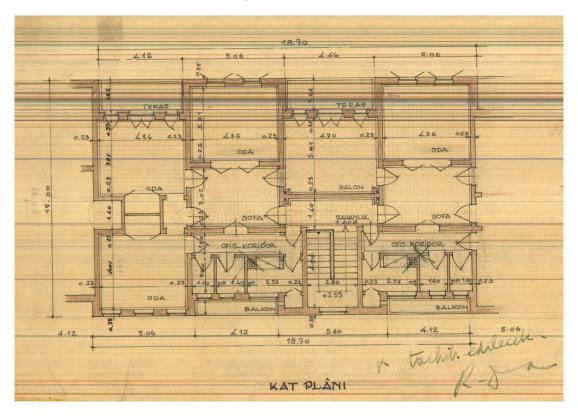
The original drawing of the double storey dwellings of officers, the floor plan, scale 1/100, Construction Section in General Directorate of TEKEL, 10.10.1944 (Source: TTA Archive)
